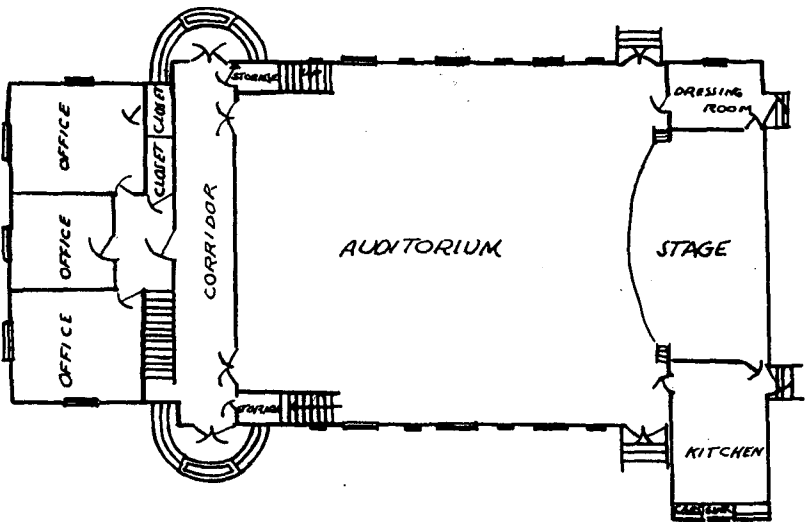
Main floor plan of the present building at the Rice County Agricultural Center.
